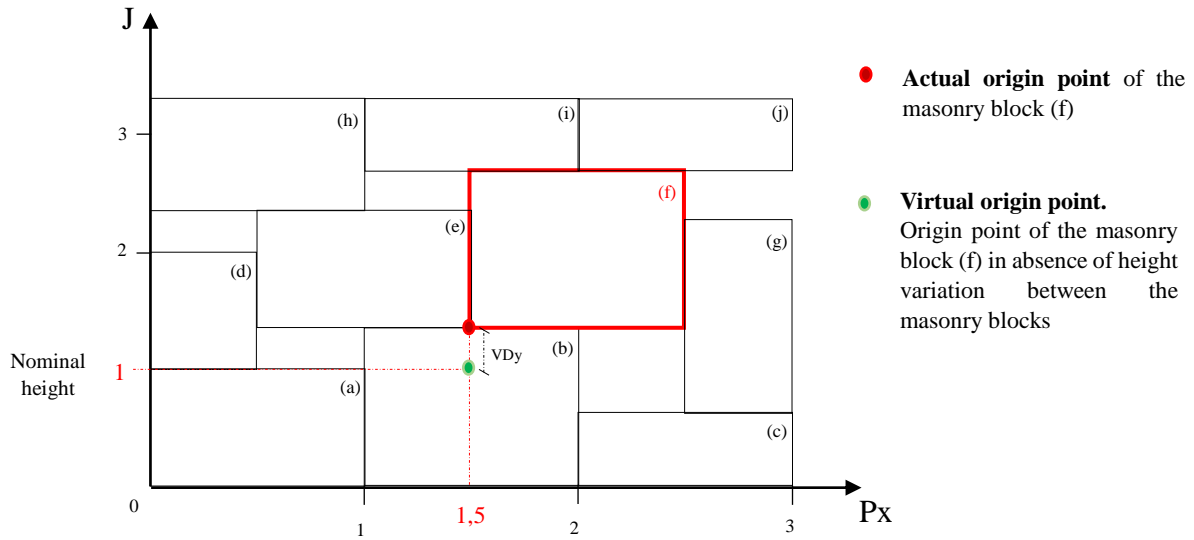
Origin points of a dry-stacked masonry block (f) in a wall.
